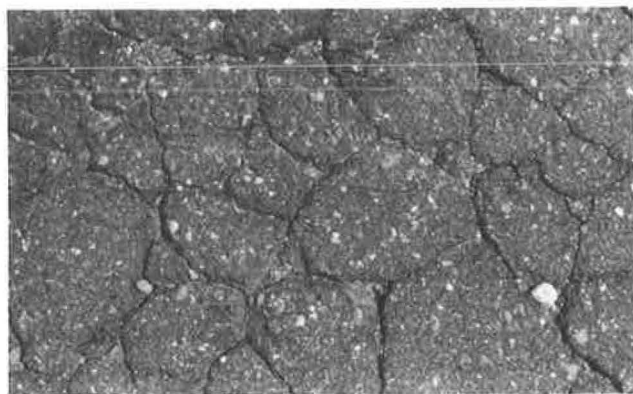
Photograph of alligator cracking in an asphaltic concrete taken with a 35-mm camera.
